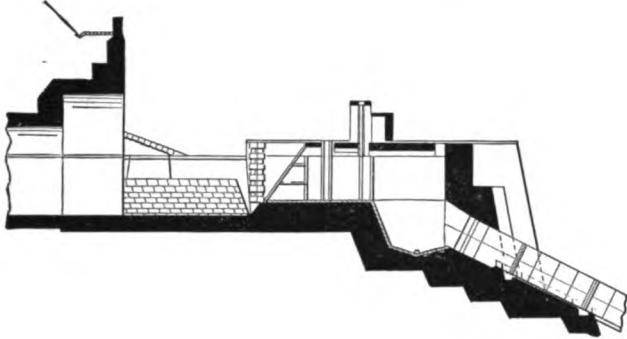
PADERNO HYDRAULIC POWER PLANT, SHOWING SECTION OF FOREBAY AND POWER HOUSE.
